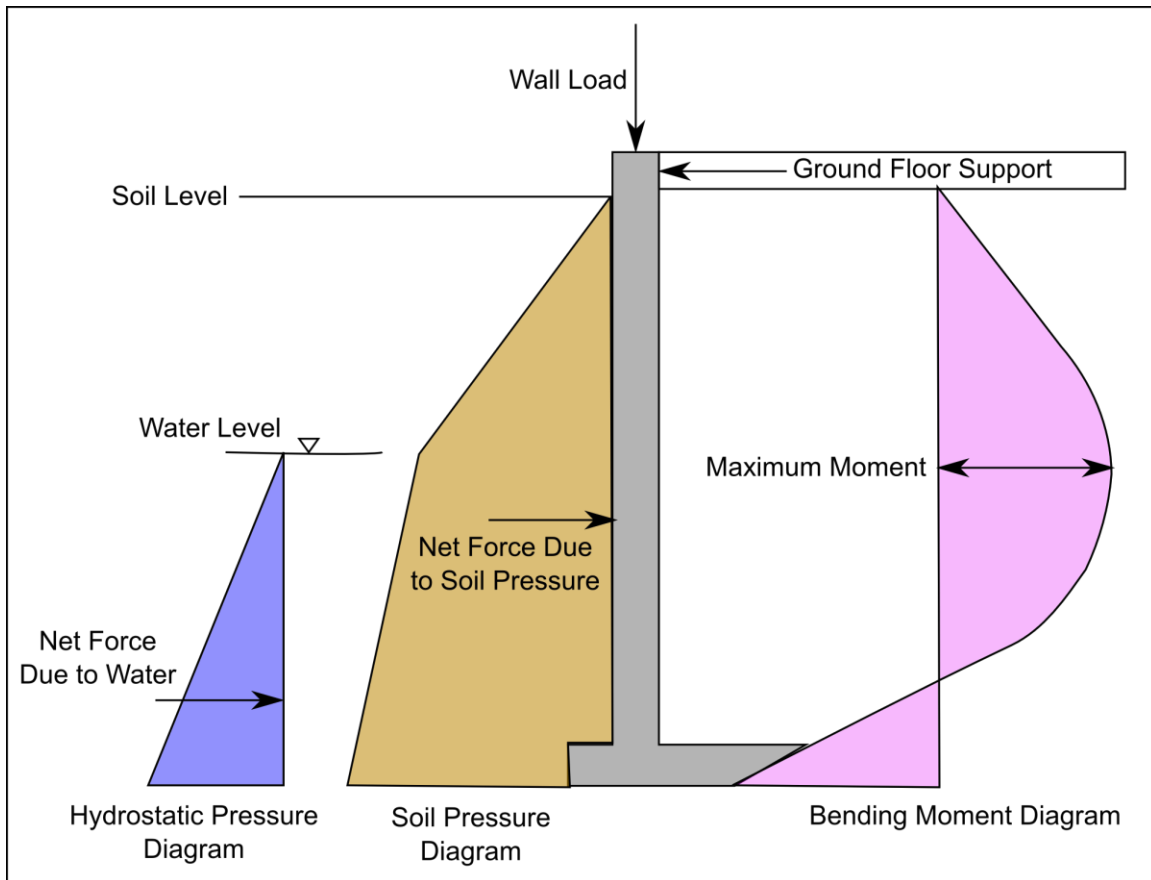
Basement Wall Loading Conditions - schematic, not to scale
